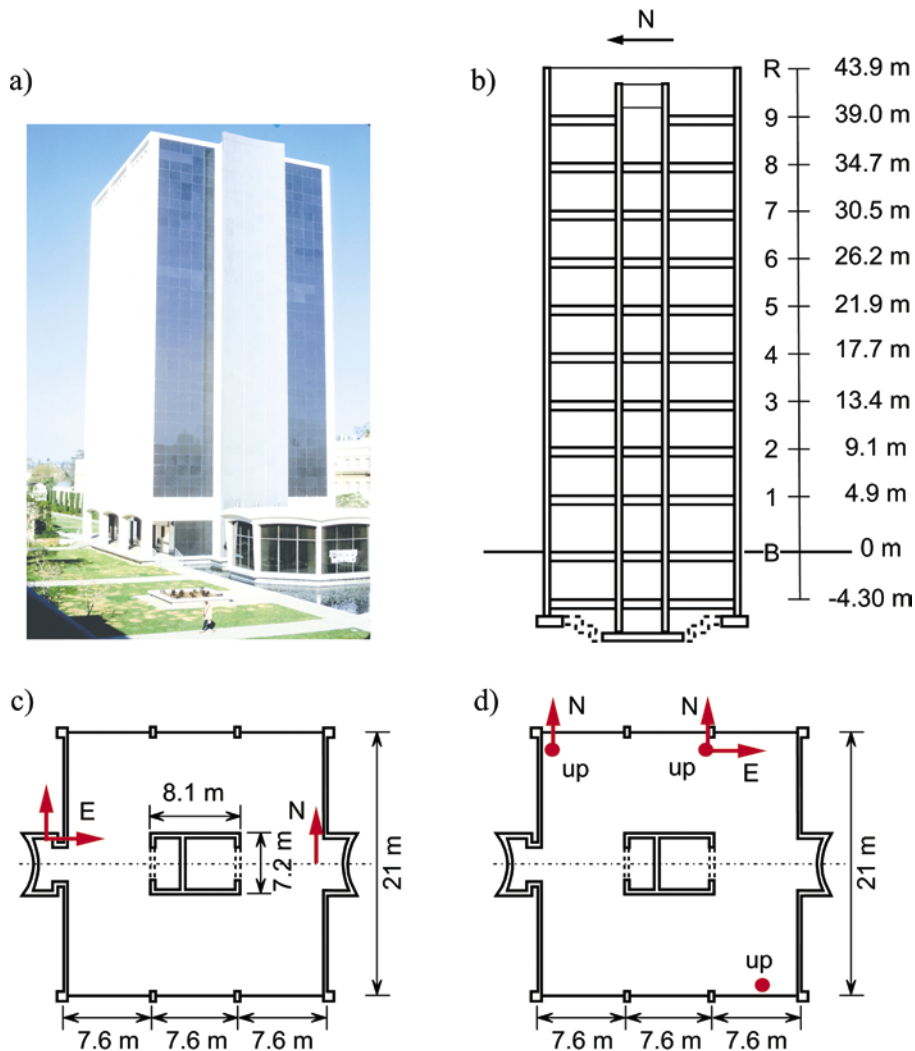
Millikan library: a) photo (courtesy of M. Trifunac); b) vertical cross-section and c) typical floor layout (redrawn from Snieder and Safak 2006); d) sensor locations at basement.
